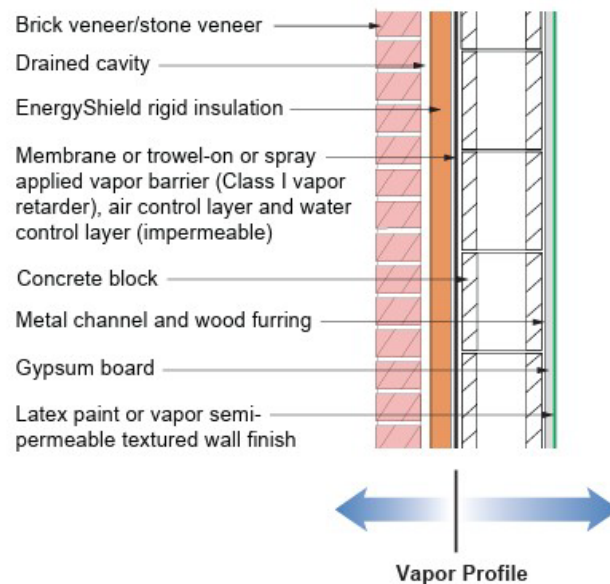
Typical control layers with a concrete block wall, masonry veneer and EnergyShield® wall insulation board.
